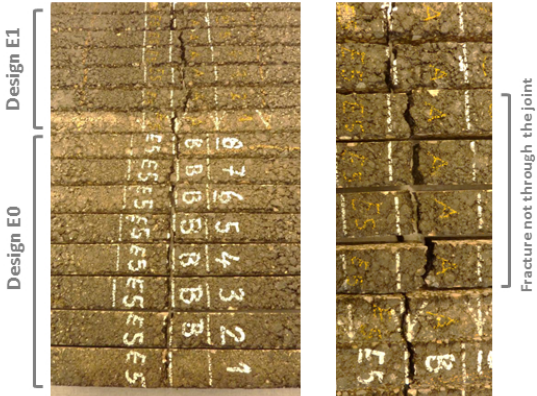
Details of fracture path in specimens with joint designs E0 and E1.
